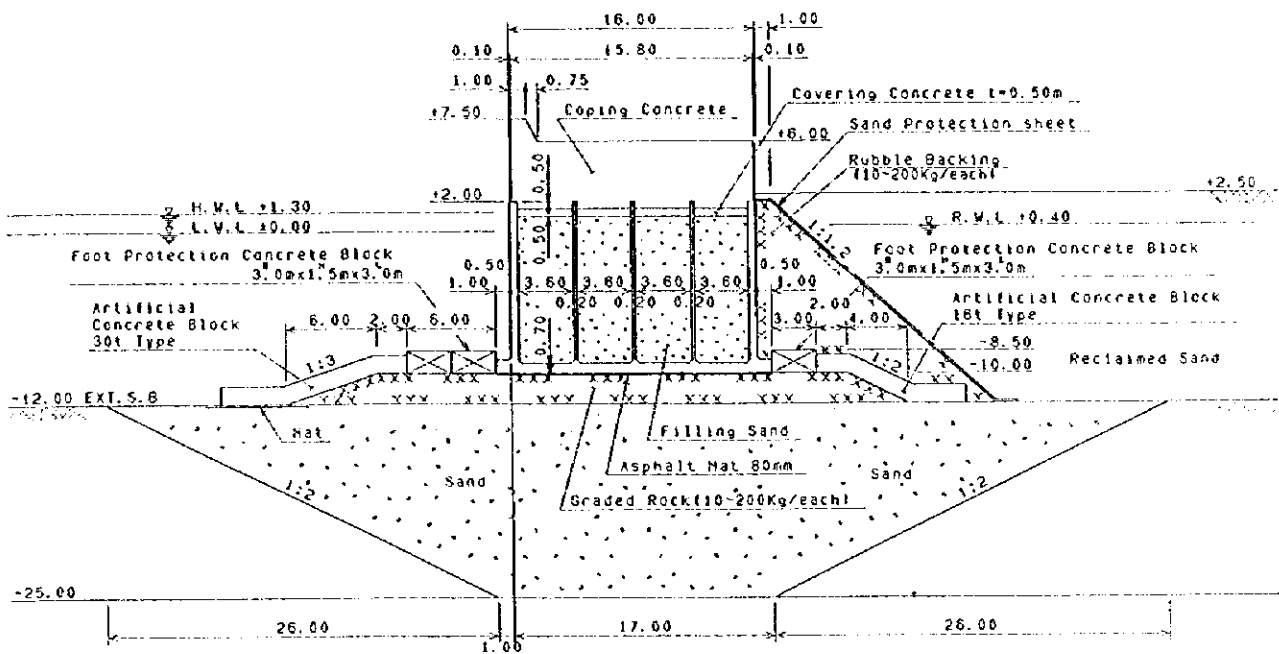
(1) Typical Cross Section of Seawall (RC Caisson)
